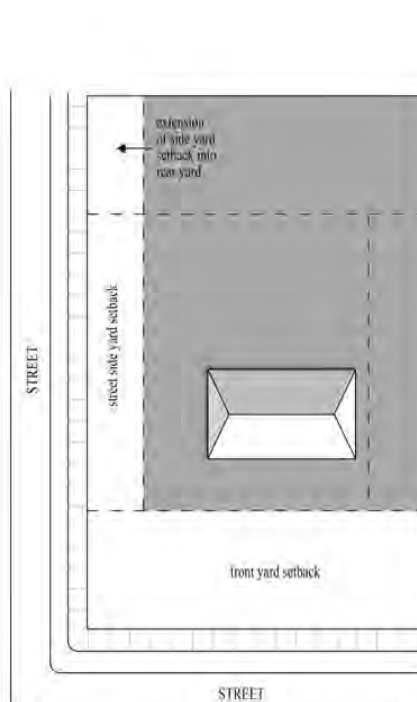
Residential Parking Locations: Corner or Reversed Corner Lot. Parking is allowed in shaded areas and on driveways in approved locations.
